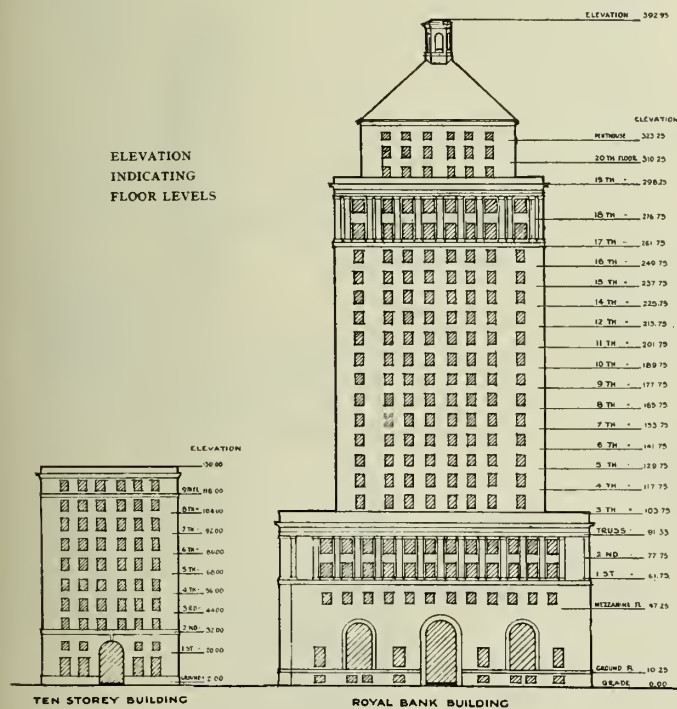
Royal Bank Building, Elevation Indicating Floor Levels.
